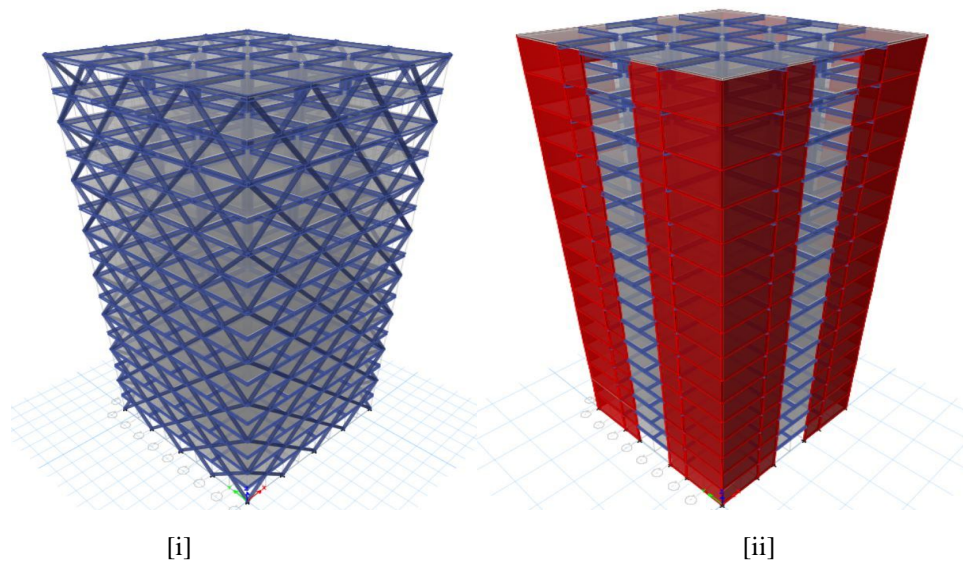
3D models of [i] diagrid building [ii] shear wall building
